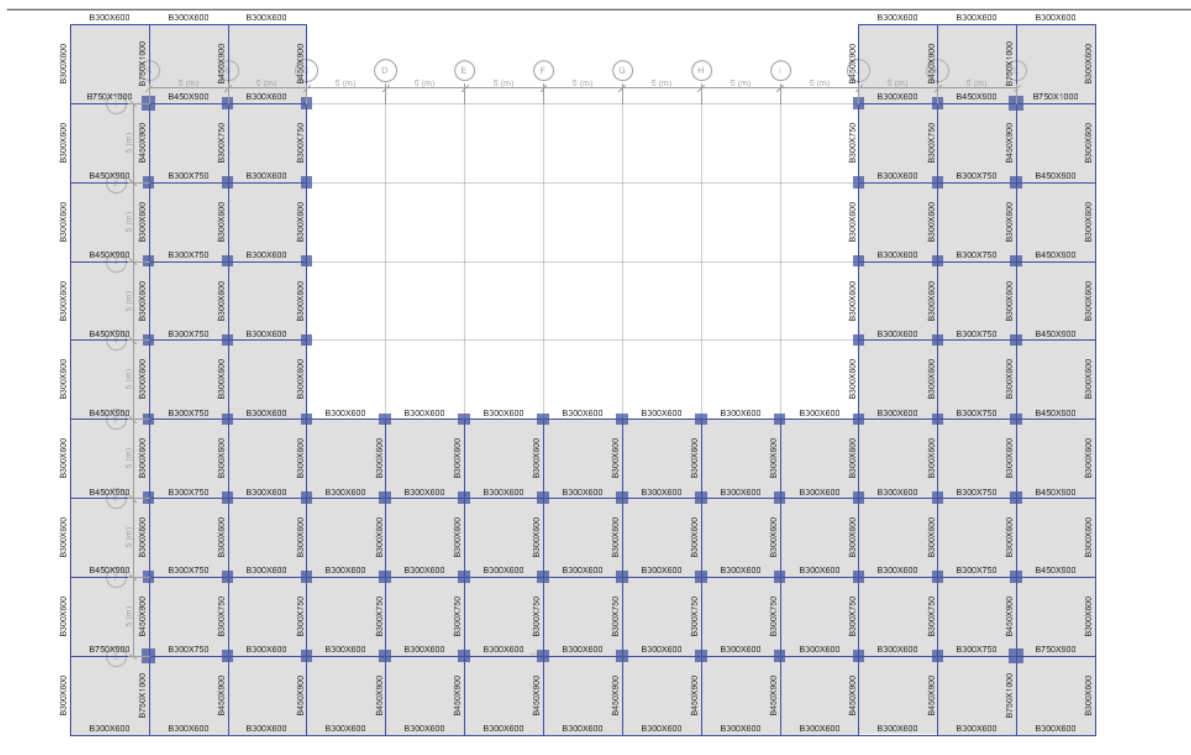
Unsymmetrical structure plan storey 9 & above.
